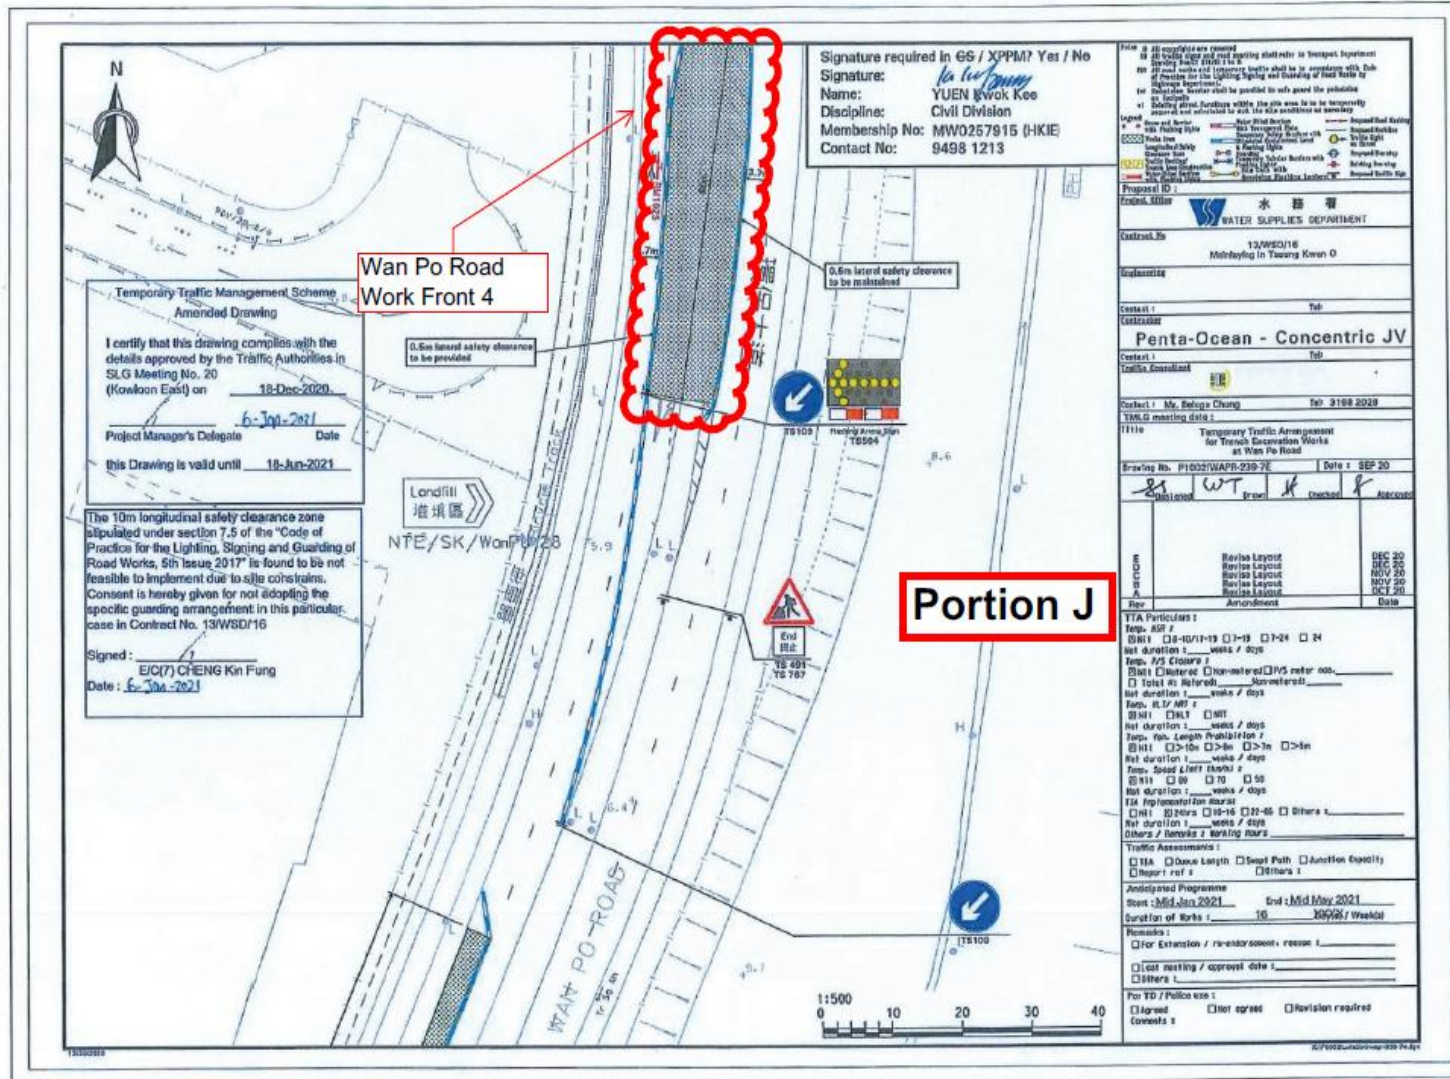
Location Plan for Portion J – Wan Po Road 4
